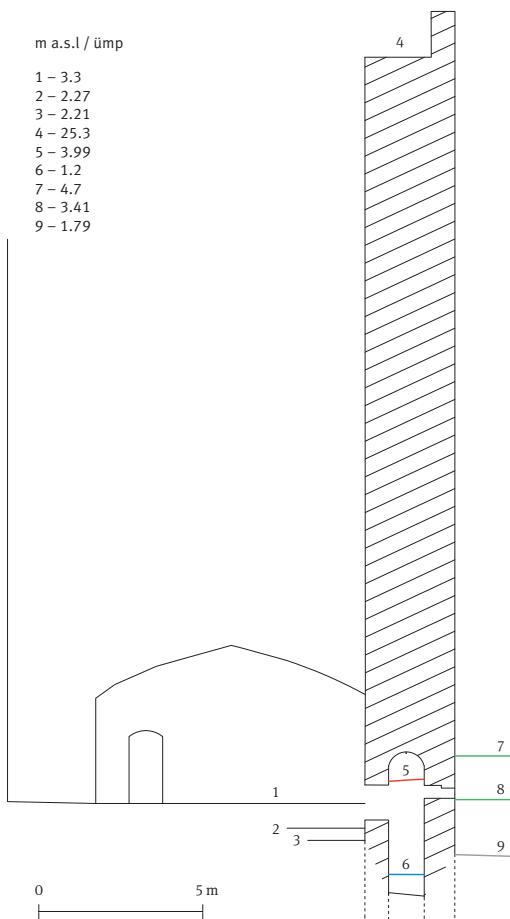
Section drawing of the well found in the wall of the Sturvolt tower. 1 – the existing stone floor of the tower (1985), 2 – elevation of the tower's original floor, 3 – elevation of the tower's foundation base, 4 – elevation of the tower's former defensive platform, 5 – filler soil from the well, 6 – the current water level, 7 – the current ground surface in the courtyard, 8 – elevation of the ground surface from roughly 1390 to 1600, 9 – natural limestone.
